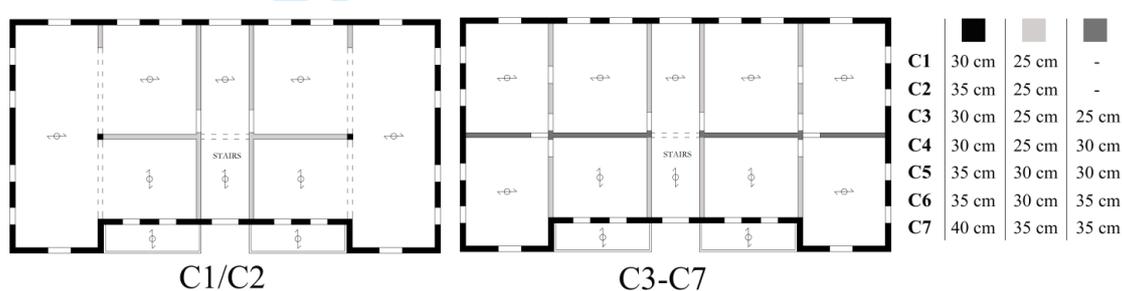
Structural configurations derived from the “C” type architectural configuration: a) C1 and C2 with internal r.c. beams and columns; b) C3 to C7 with internal masonry walls.
